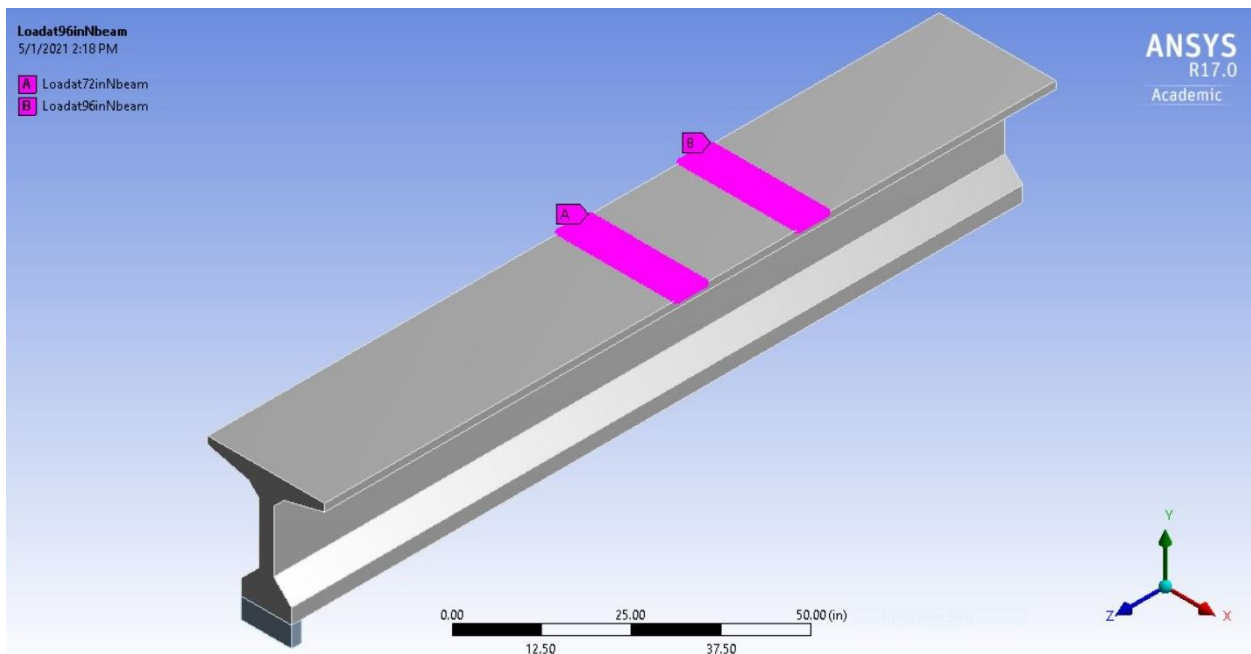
Example of Load Application to Beam End JJ1 South at 72-inches and 96-inches from Beam End Supported by Neoprene Pad
